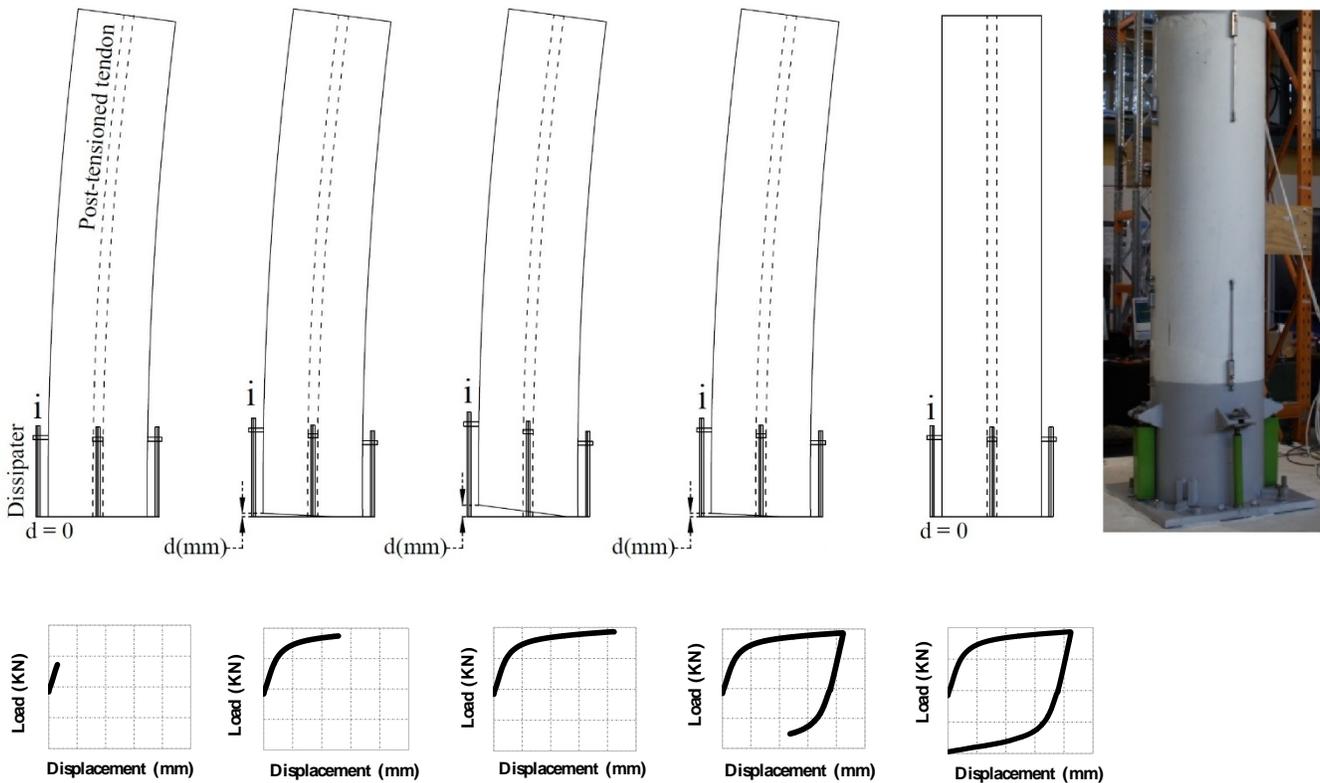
Schematic rocking bridge pier, stress-strain of dissipater i with a photo of a rocking bridge pier
